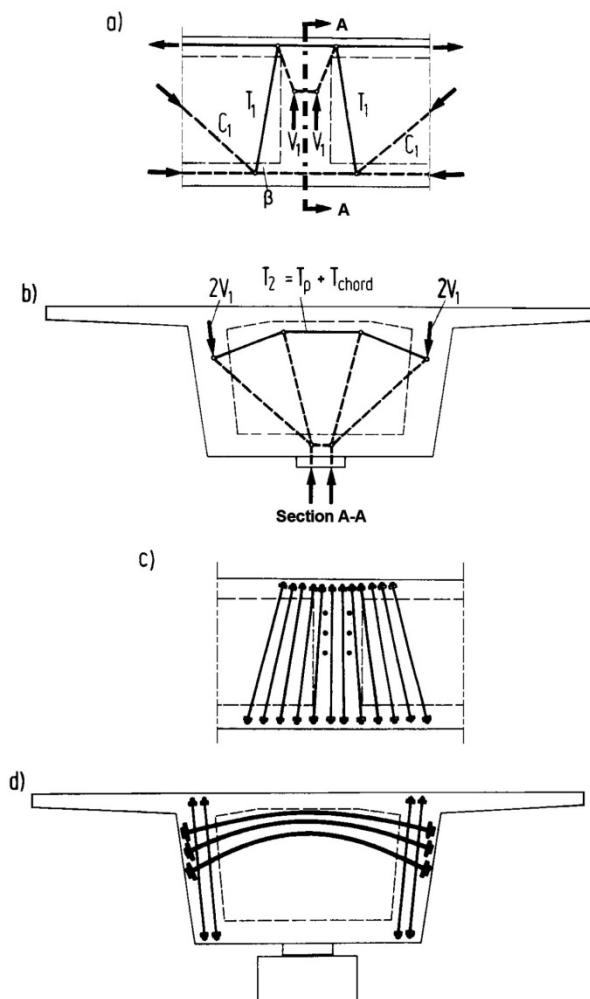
Diaphragm of a Box Girder Bridge:
